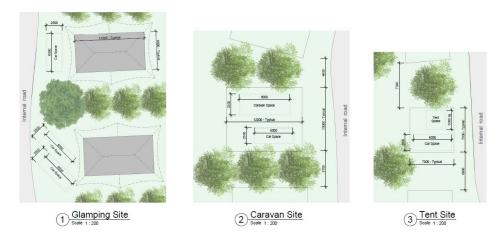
Indicative Glamping Site, Caravan Site and Tent Site Plan
